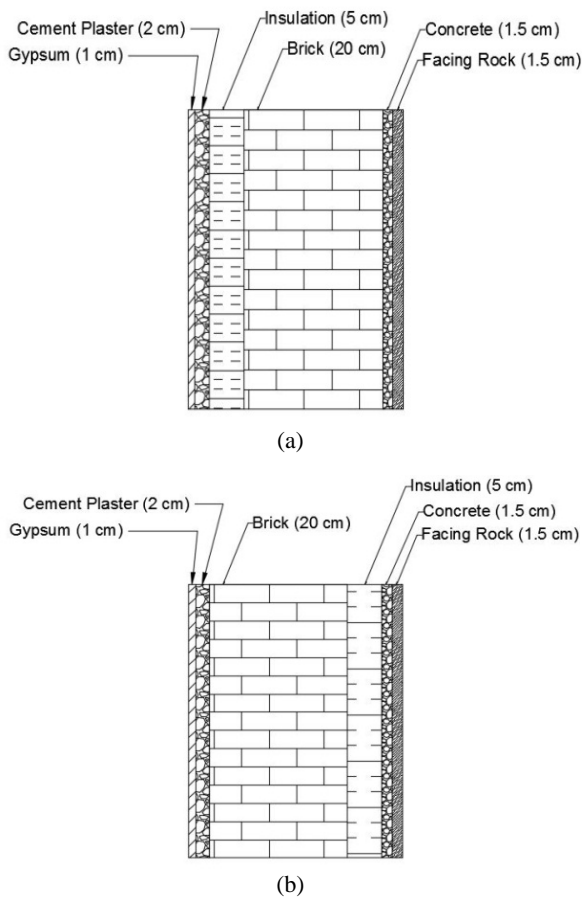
Wall's layer's configurations: a) internal insulation and b) external insulation.
